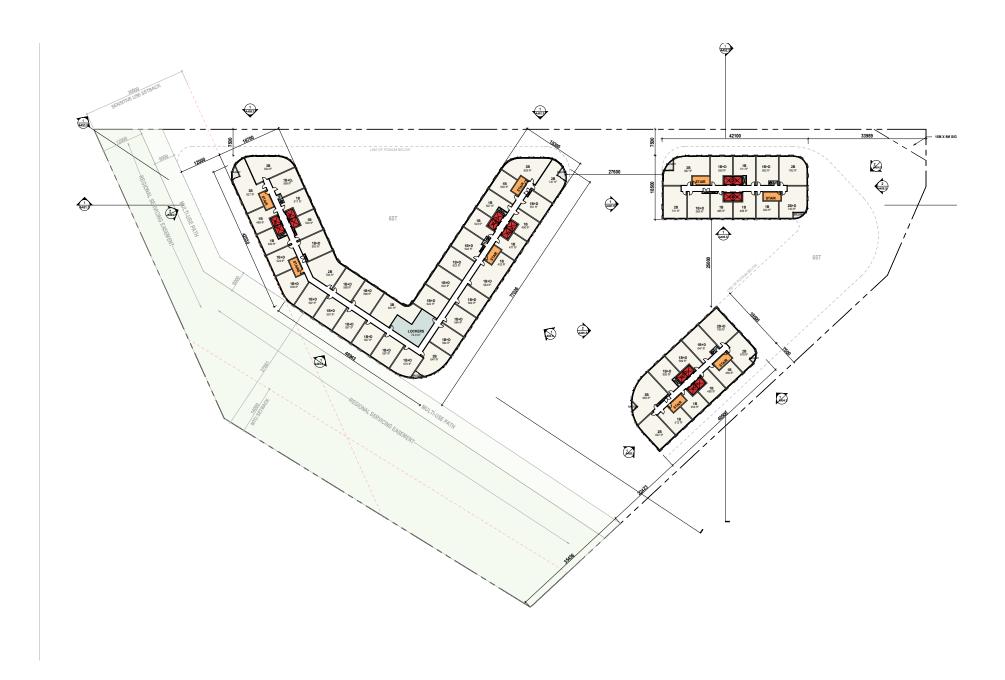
Level 8 Floor Plan (BDP. QUADRANGLE ARCHITECTS LTD.)
